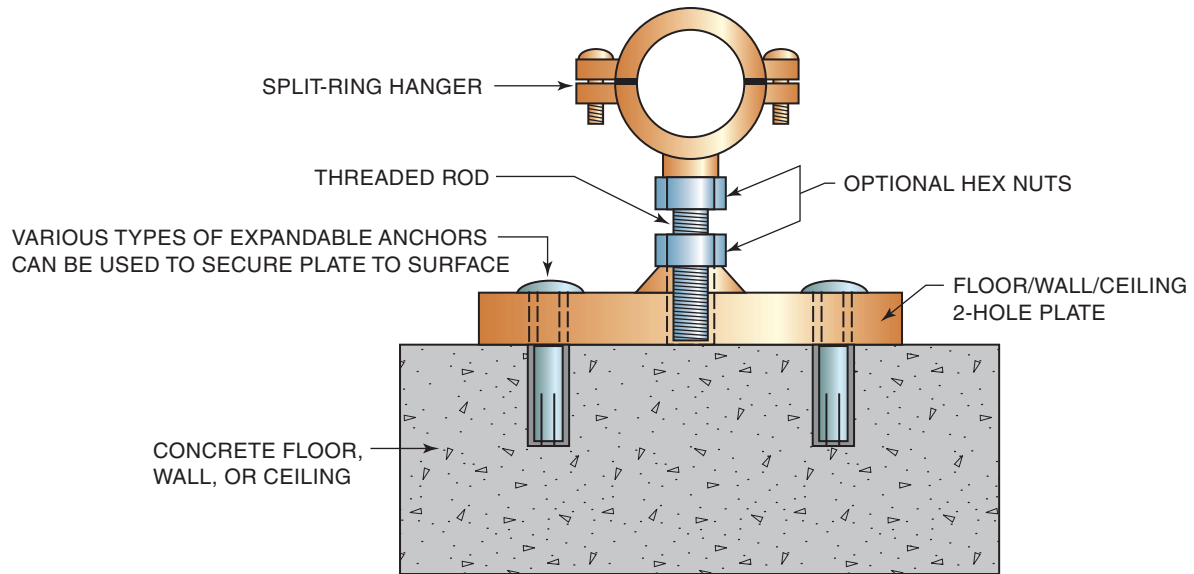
A 2-hole plate and various expandable anchors can be used to install piping along a floor, wall, or ceiling.
